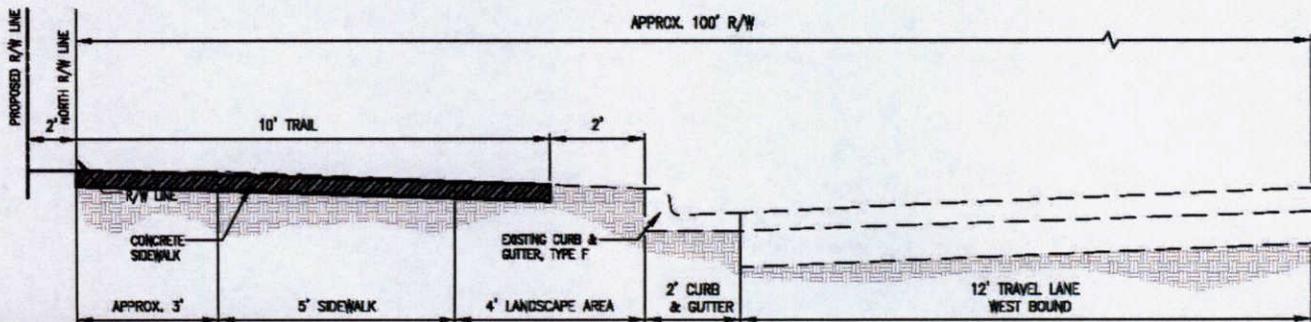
Typical Sections – Roadways & Trails – Section A
